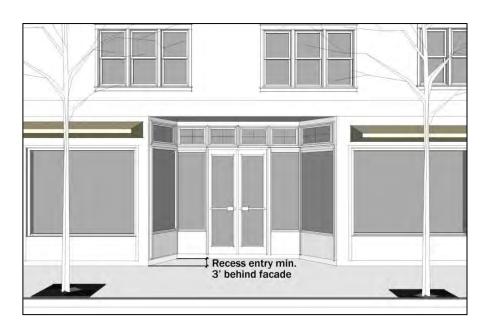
TRASPARENT BUILDING ENTRIES
